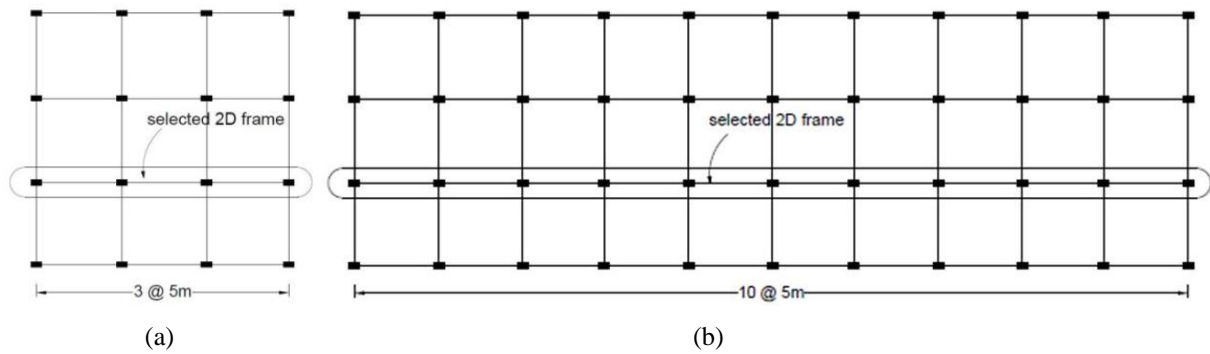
(a) Plan view of 11 and 4 storey buildings. (b) Plan view of 4 storeys 10 bay building.
